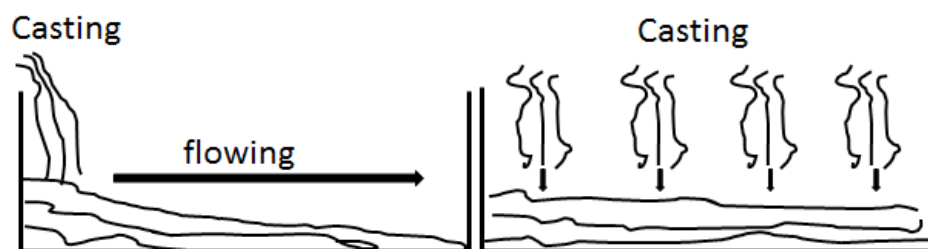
Employed casting methods: (a) cast at one side of the mould with flowing process (optimized casting); (b) cast randomly without flowing process (non-optimized casting)
